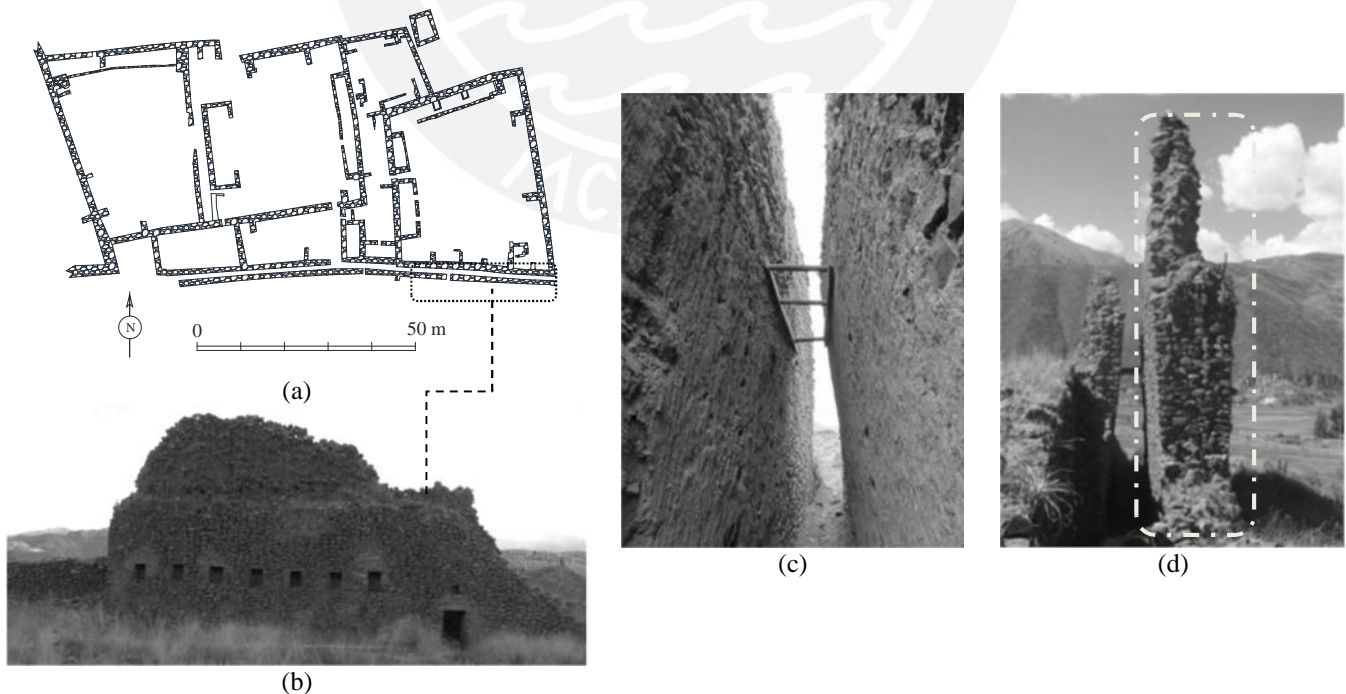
General views of the studied area : (a) plant view of the studied sector [8], (b) elevation of the instrumented wall, (c) timber struts connecting the two studied walls and (d) section view of the instrumented wall
